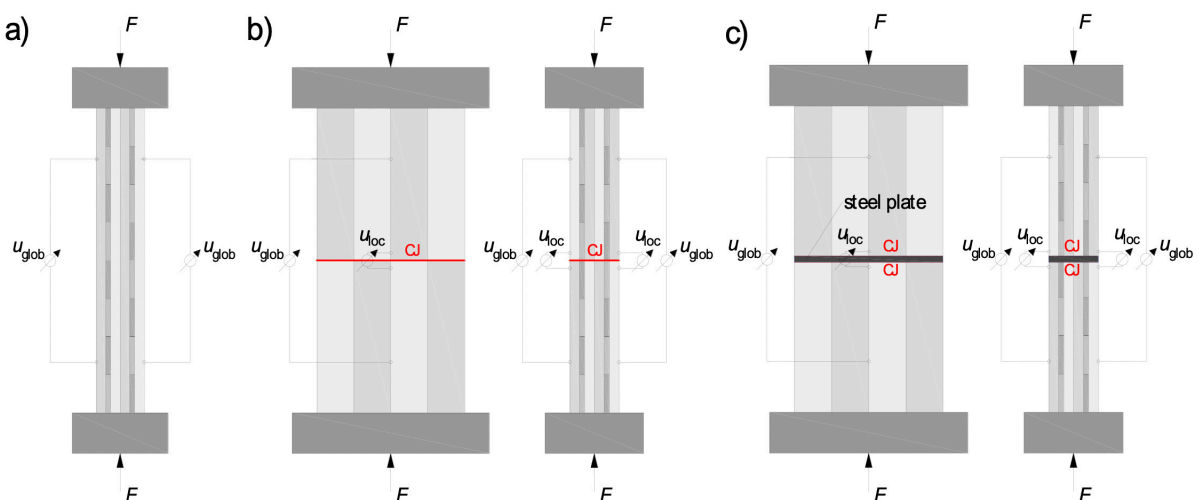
Test setup used for CLT specimens without contact joint (a), with contact joint (b) and with steel plate in the contact joint (c).
